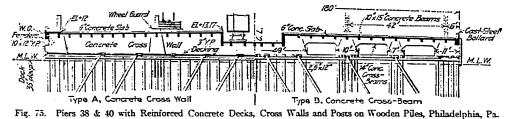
Reinforced Concrete Details of Piers 38 & 40 in Philadelphia
